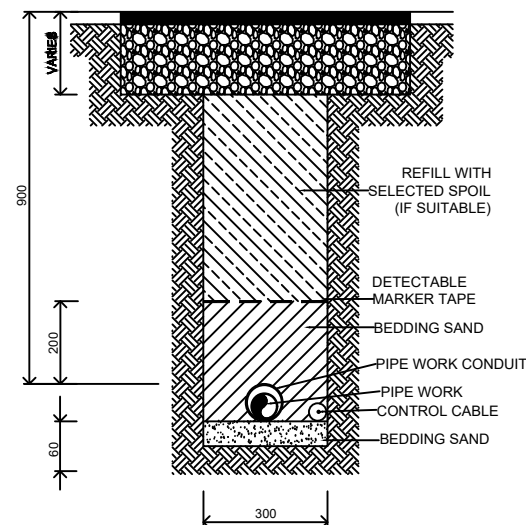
TYPICAL SHARED MAINLINE/ LATERAL TRENCH
